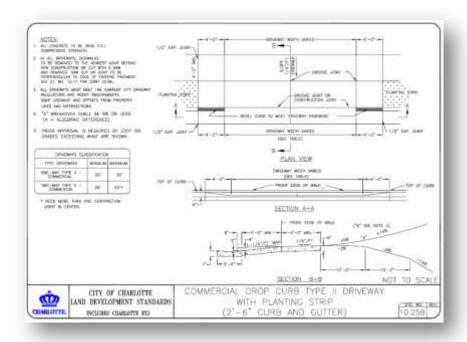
Commercial Type II & Residential Type I Driveway w/ Planting Strip
